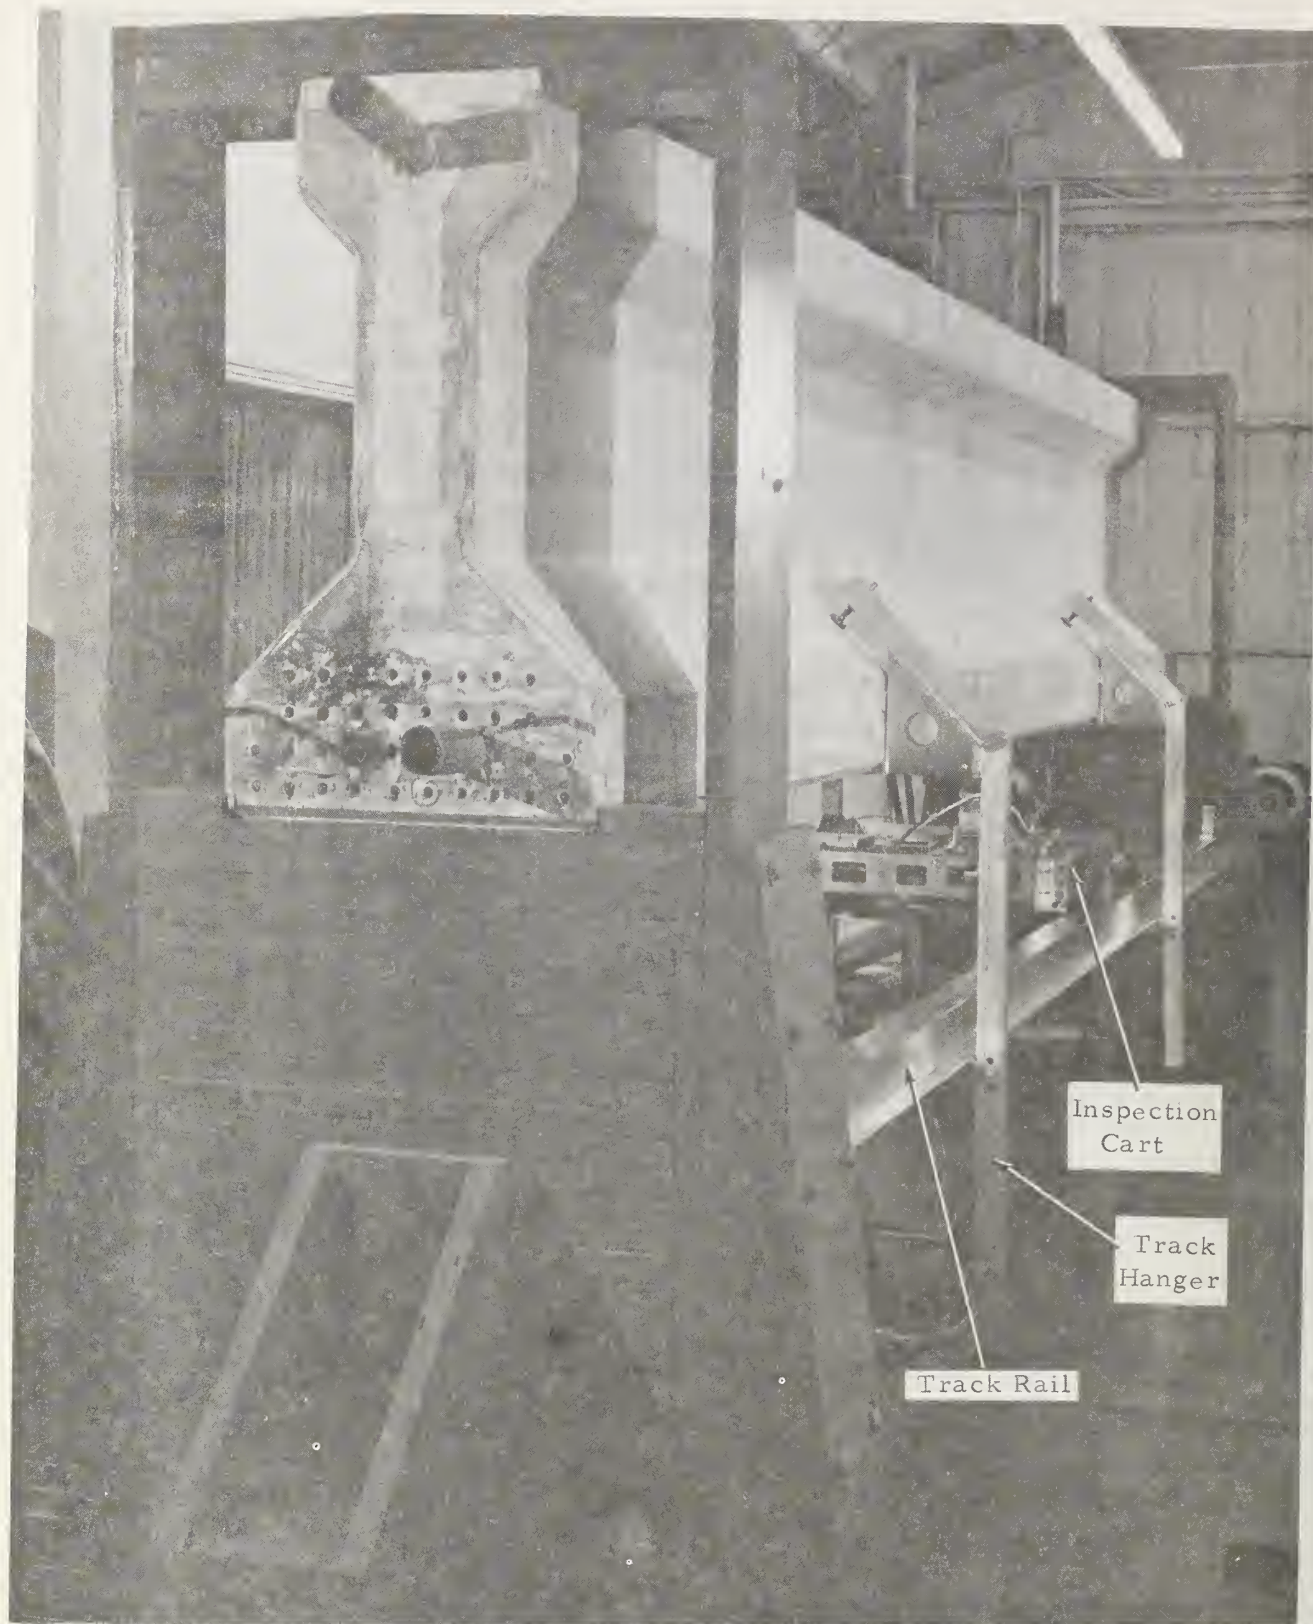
OVERALL VIEW OF TRACK ASSEMBLY AND INSPECTION CART INSTALLED ON TEST BEAM IN THE LABORATORY
